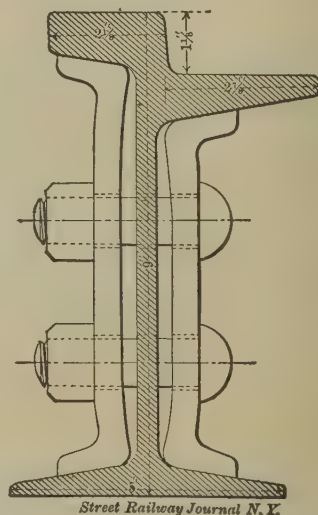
HIGH GIRDER RAIL—PHILADELPHIA TYPE.
